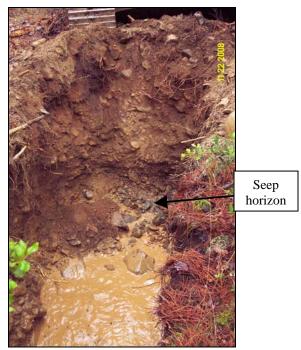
Another excavation test pit showing typical stratigraphy and ground water inflow.
